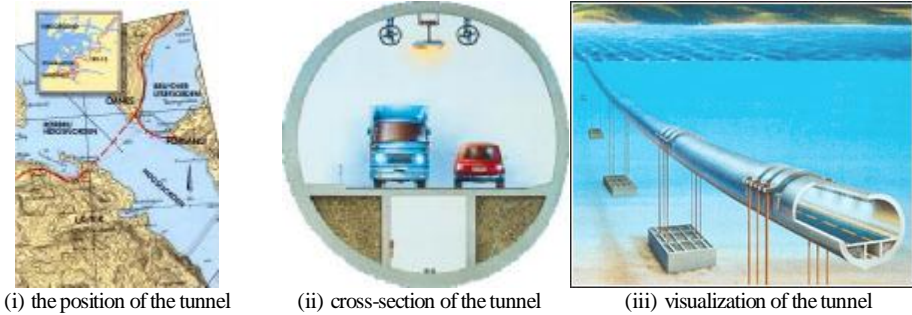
Underwater tunnel “Høgsfjord”, Photo: Statens Vegvesen Rogaland [36]
